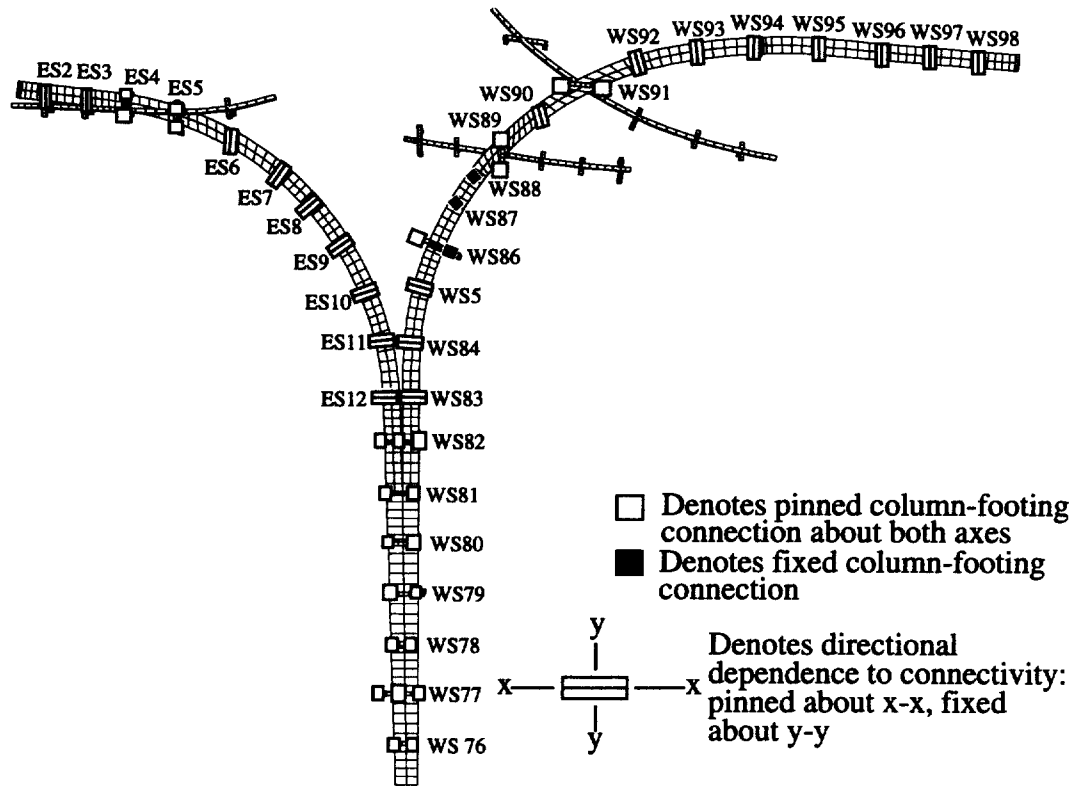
Column - footing connectivity based on the as-built construction details.
